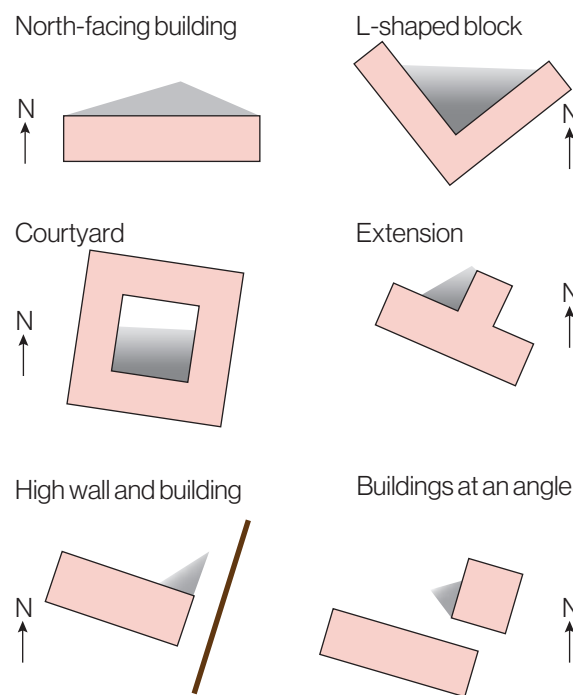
Layouts where poor sunlighting on the ground can occur. The shaded areas will receive no sunlight at the equinox.
